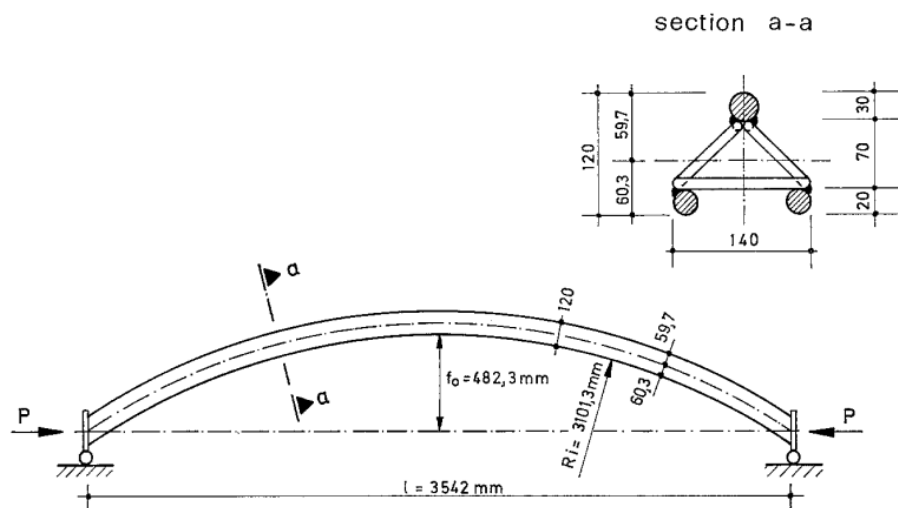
Loading test on lattice girder (Baumann and Betzle, 1984)
